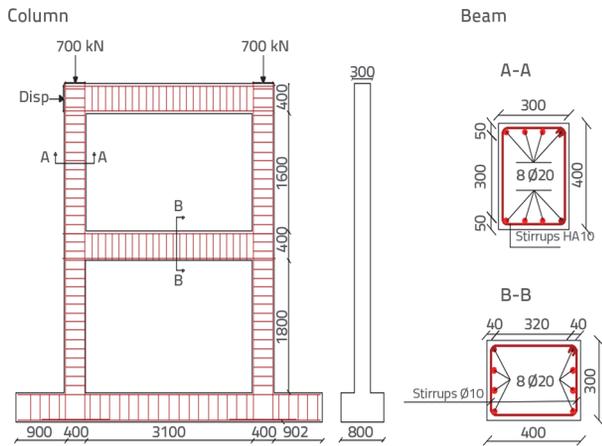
Geometrical view of two-storey portal, sections, reinforcing details and loading [10]
